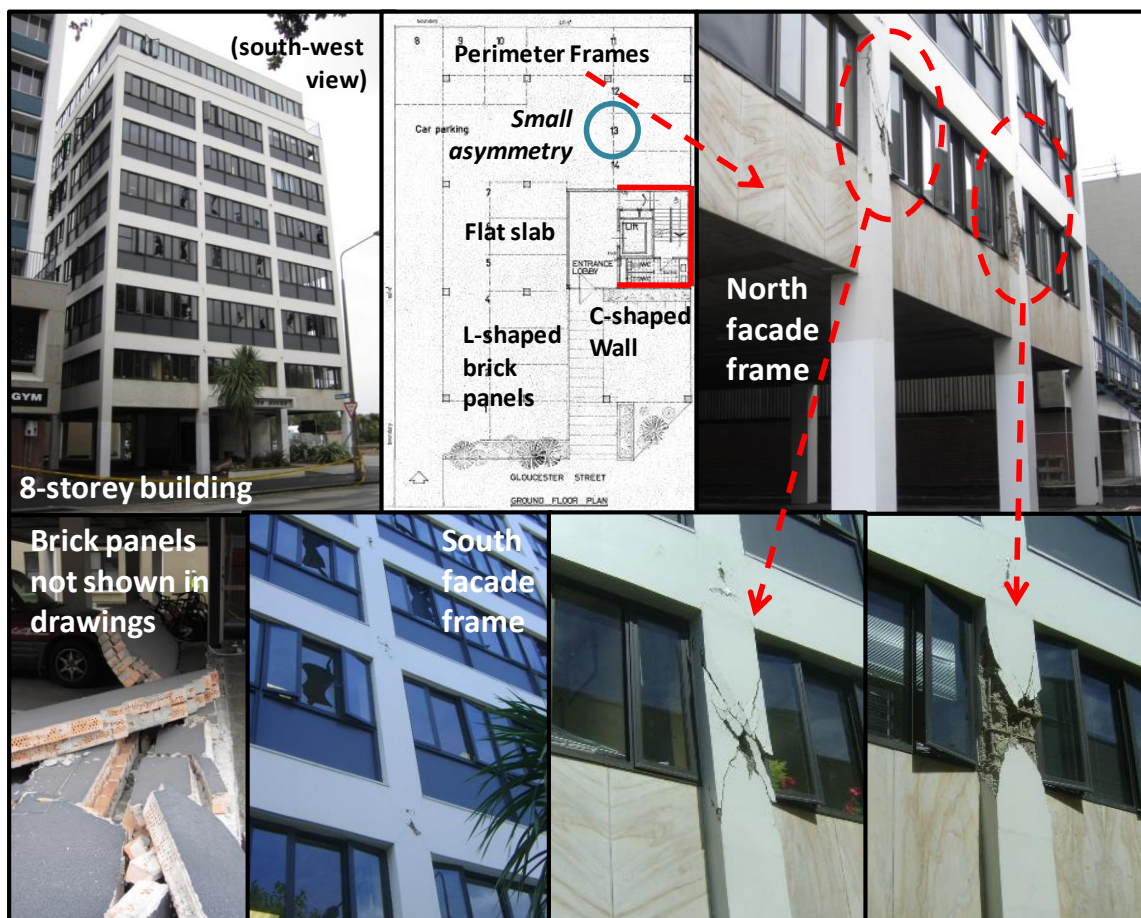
Building 'D' (8 storeys): Structural layout and observed damage.
